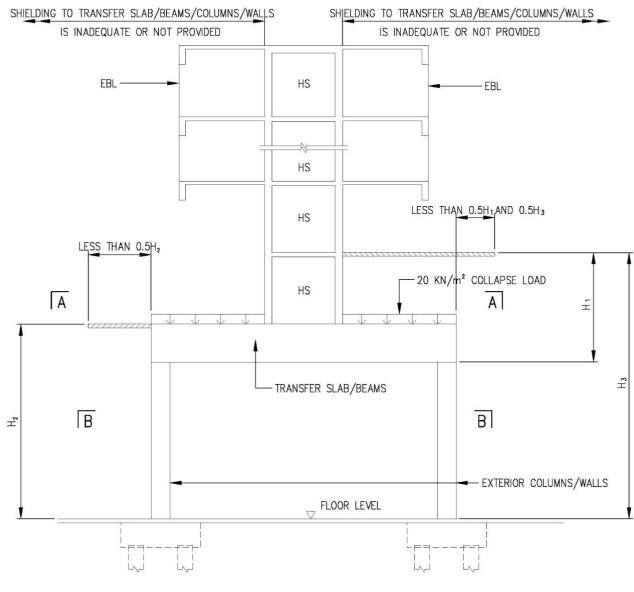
(a) SHIELDED TRANSFER SYSTEM THAT SUPPORTS HS TOWER
